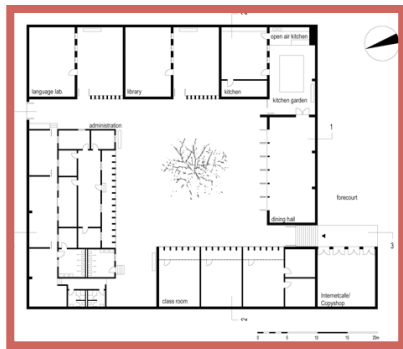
Floor plan Educational Centre in Nyanze (source google)
